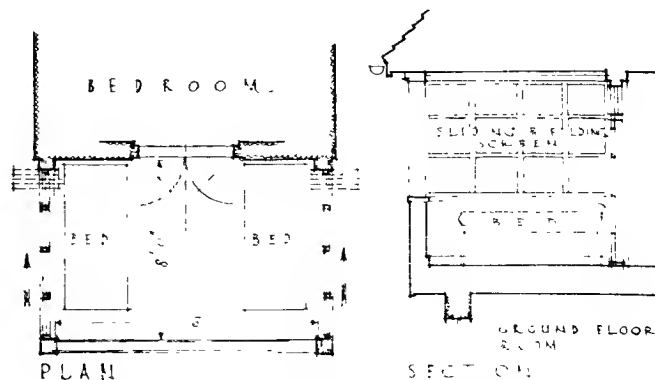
The sleeping porch: a typical plan on the end of the bedroom wing
